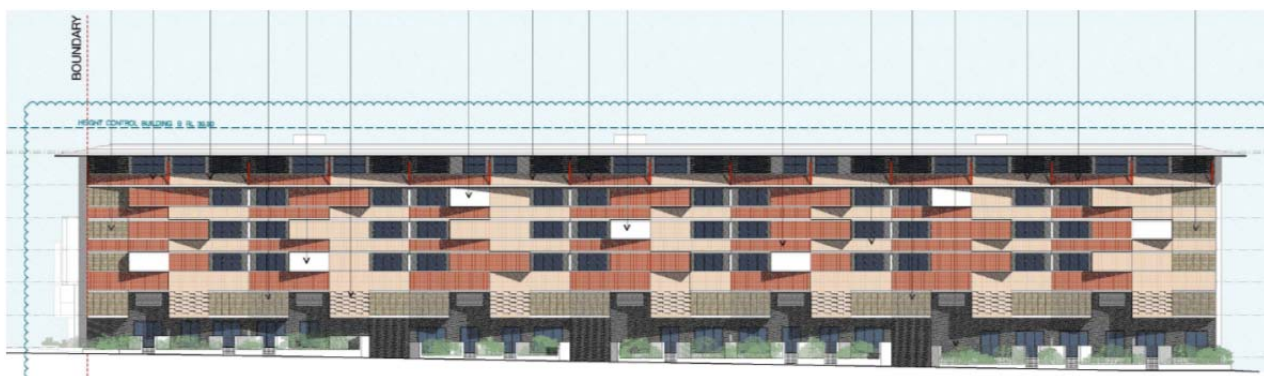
Building B north elevation (view from Future Sonny Leonard Street)
